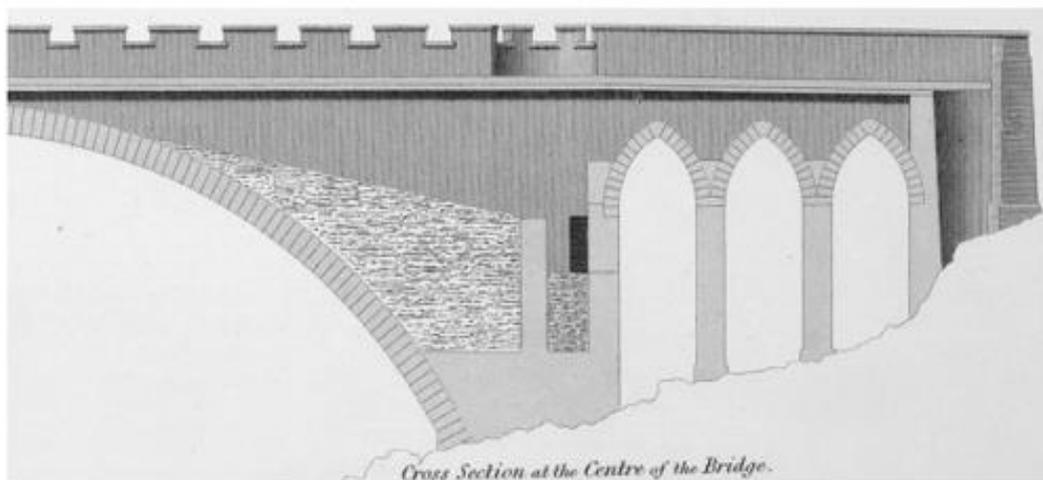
Sketch showing Part sectional elevation of the bridge from archive drawing
